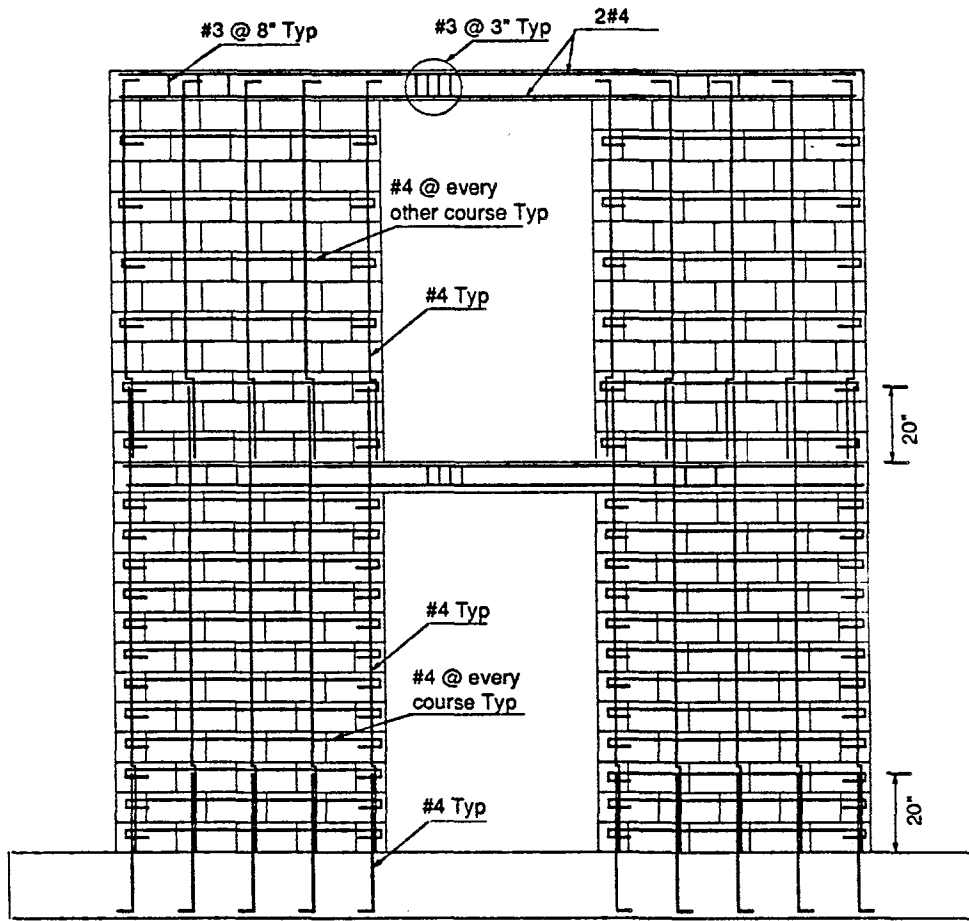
Specimens 2a and 2b, wall reinforcement.
